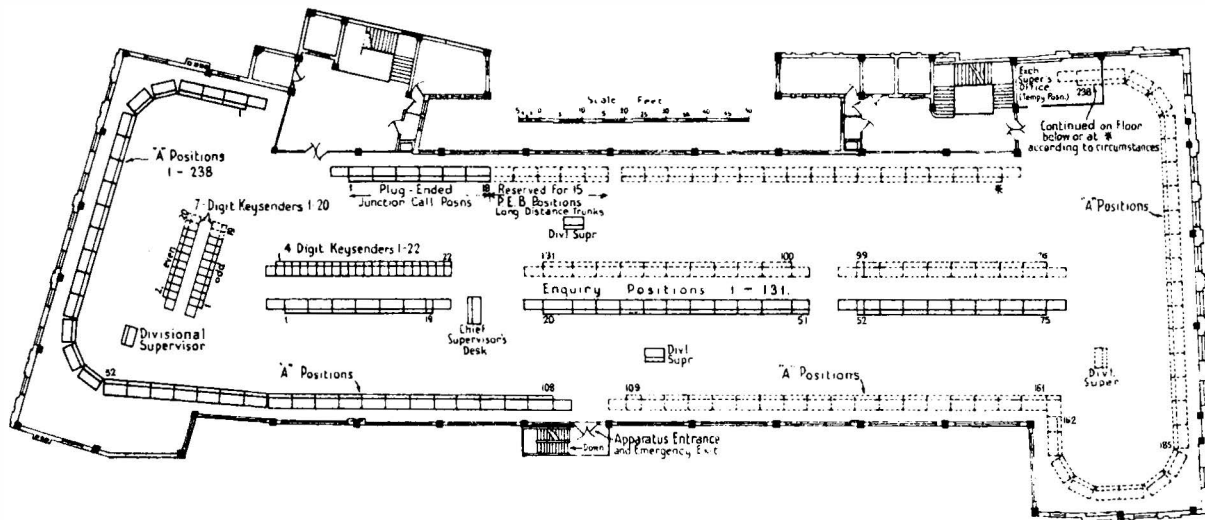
MANUAL SWITCHROOM, LAY-OUT PLAN.
